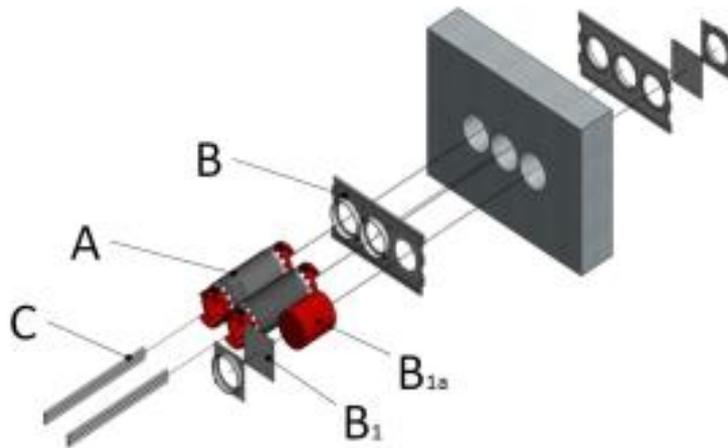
Ganged device installation details flexible and rigid wall and sandwich panels (image reproduced from ETA 17/0081)
